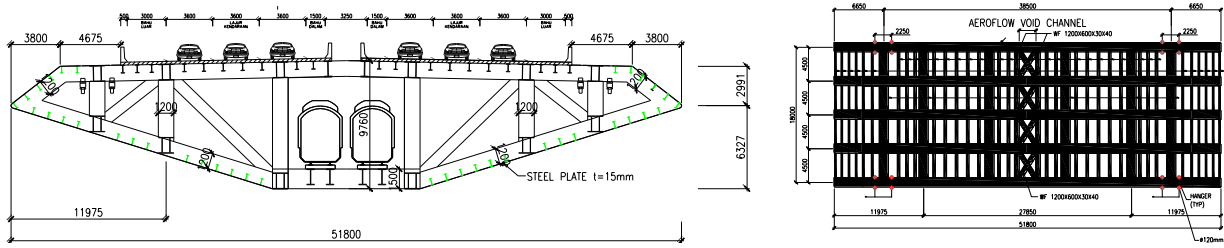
Deep twin box girder of Sunda Strait Bridge
